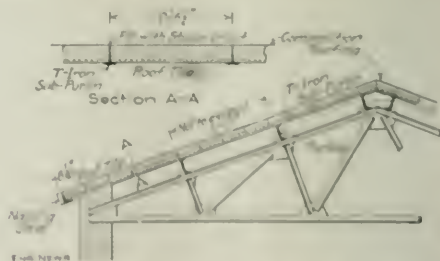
ROOFING DETAIL SHOWING REINFORCED GYPSUM TILE LAID BETWEEN T-SECTION SUBFLOORS
